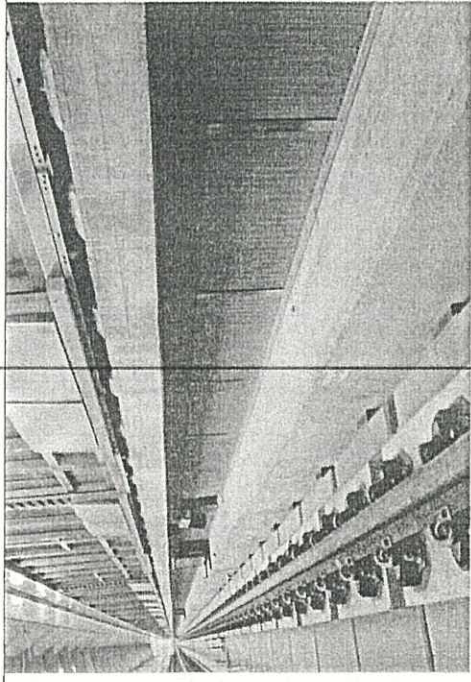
Acoustic Panels Installed Underside of the Station Platform at TIS
